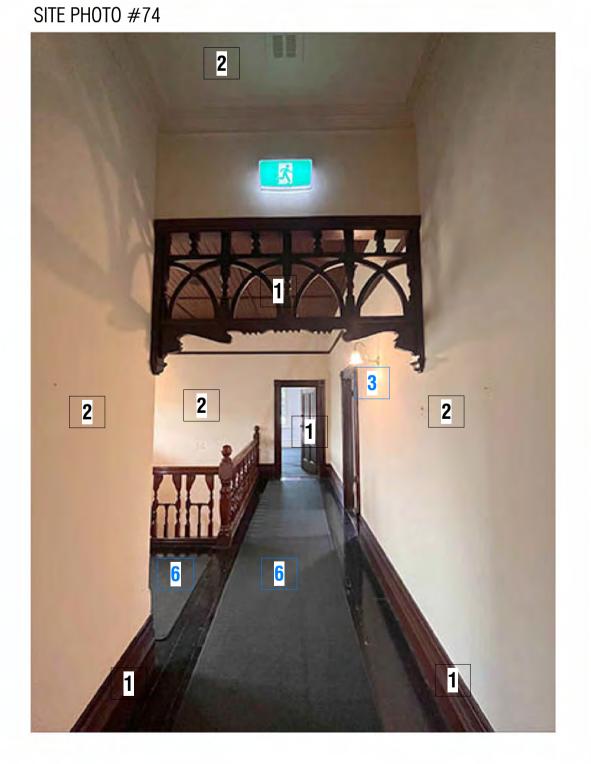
PHOTO - VIEW OF MAIN STAIR TOWARDS BALCONY
